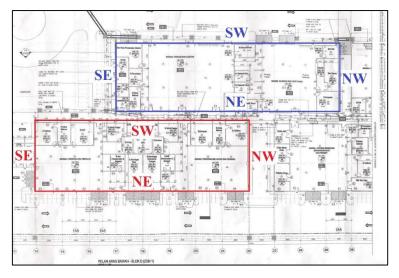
FPTV (Block D) - Left Side of Floor Plan Drawing (Ground Floor)
